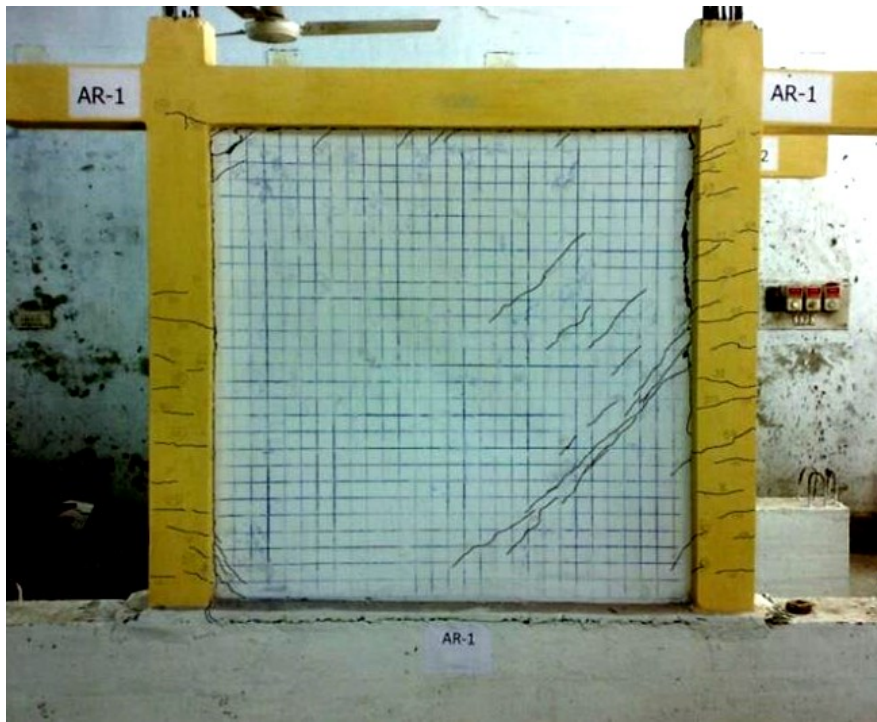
(a) Crack patterns at peak load in repaired brick infilled RC frame model specimen AR1
